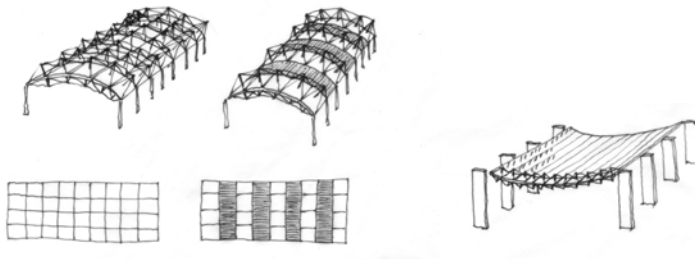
Vaulted plate structures in perspective and plan and a hanging roof.
